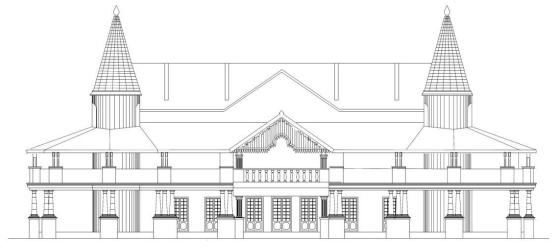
Victoria Jubilee Town Hall Front elevation Source: Author
